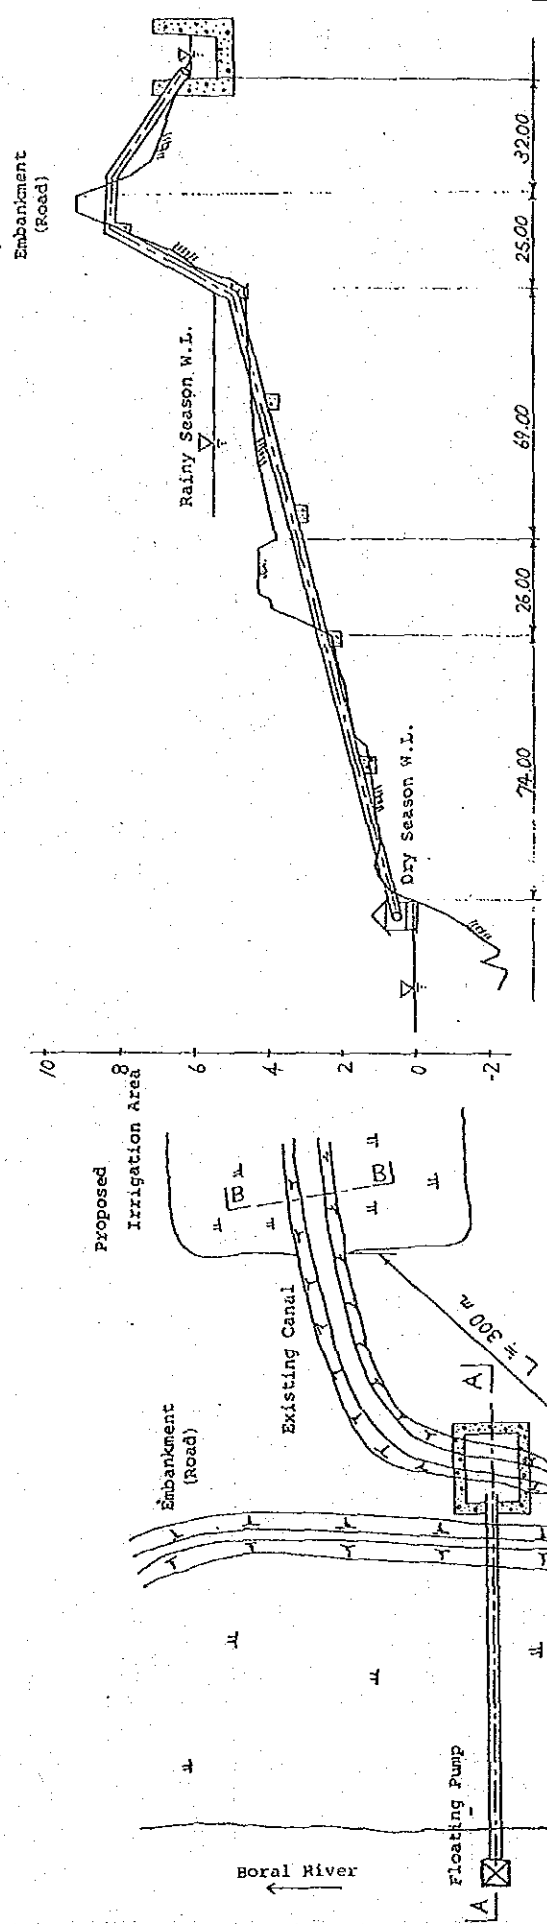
PLANNING LAYOUT OF FLOATING PUMP SITE, SHAHJADPUR UPA-ZILA, SANTHIA
